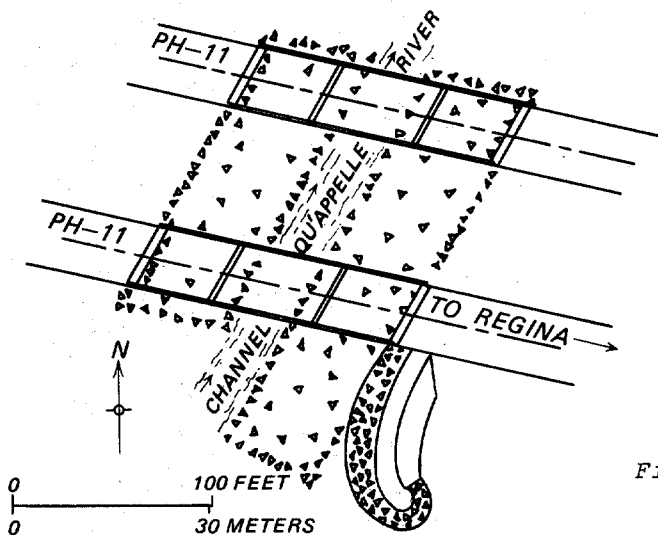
Guide bank and riprap revetment installed at PH-11 bridge after 1974 flood.
